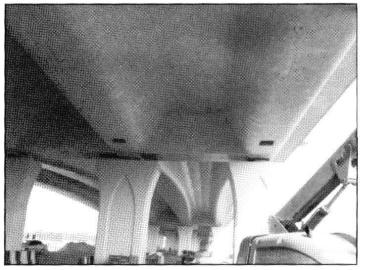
Main Bridge deck (Before applying epoxy coating for high quality of concrete finish.)
